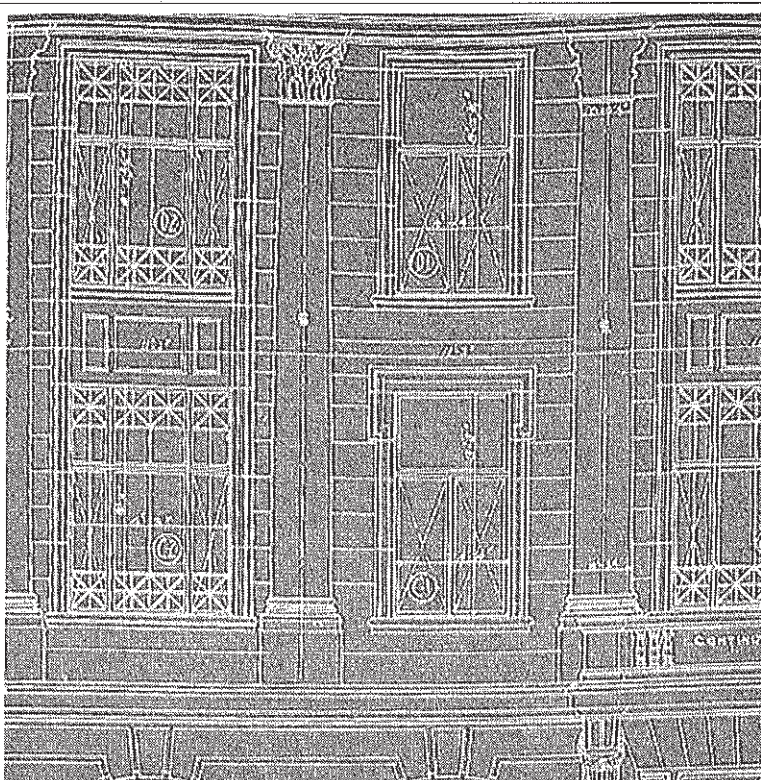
Detail of upper windows and columns from architect's drawing (1923) for east and west elevations. Replacement sash has fewer openable lights. Fragility of the 3x4 ft. sheet prohibited flattening in order to photograph. Drawings courtesy of the Vermillion County Surveyor.
